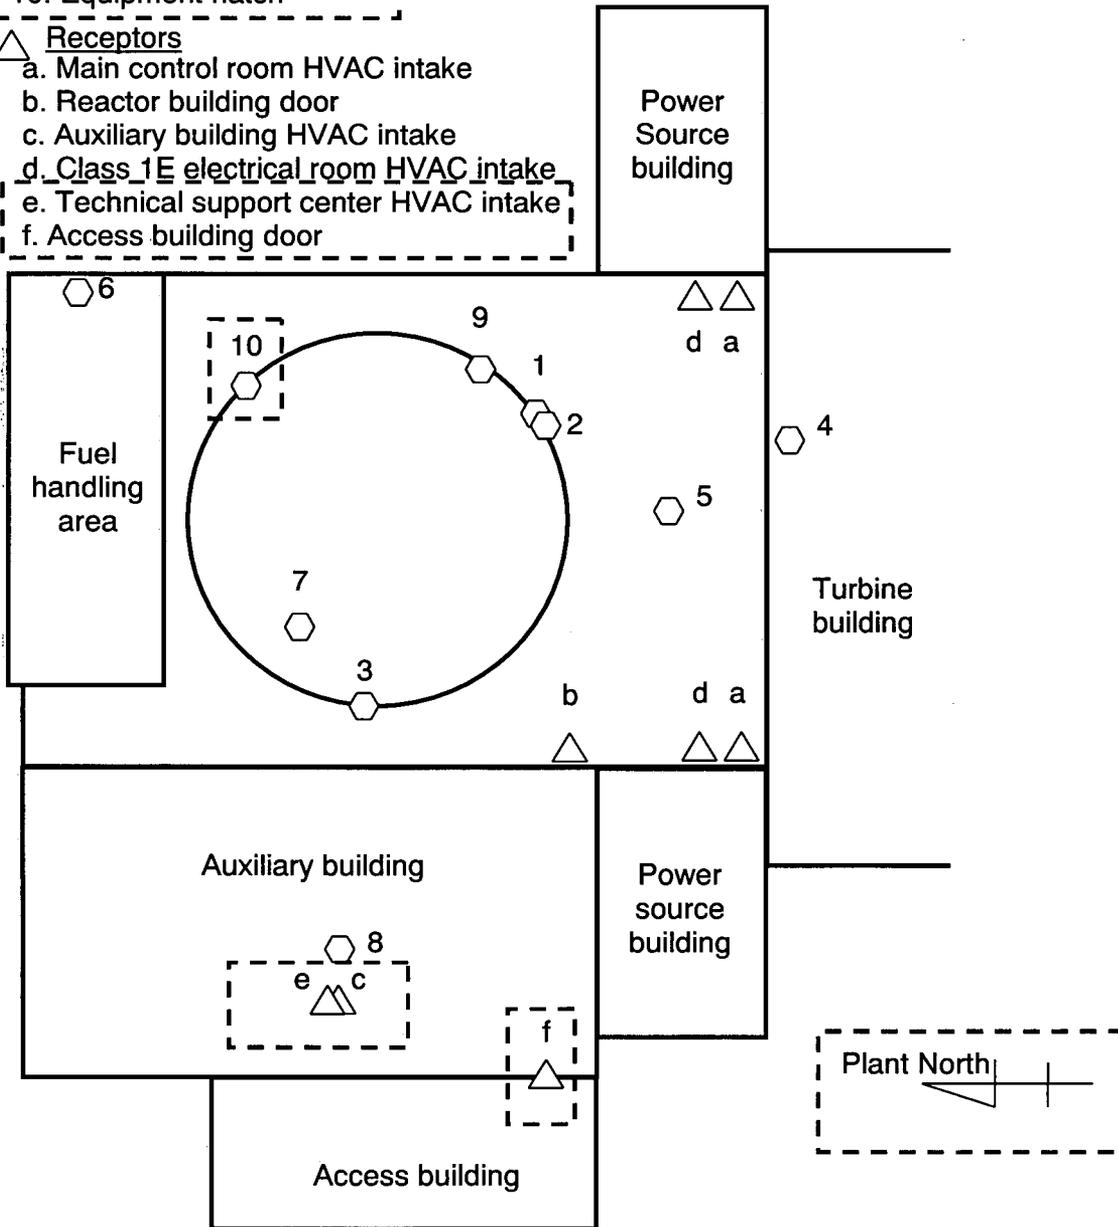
Site Plan with Release and Intake Locations
